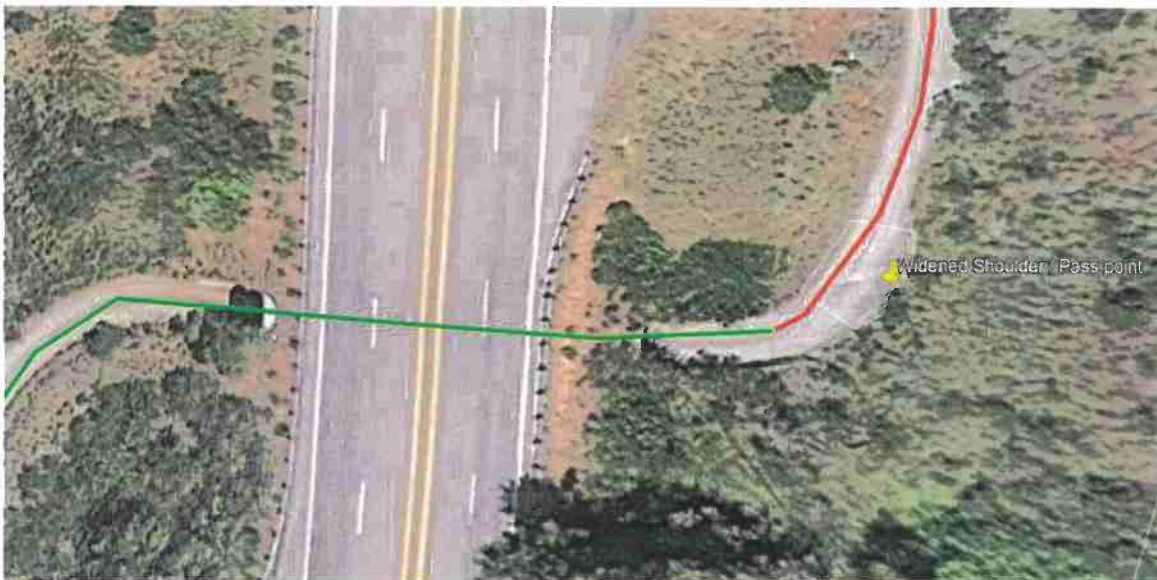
Location of possible pass-point near tunnel. STA: 57+02FT near transition point from road segment 7 to 8.
